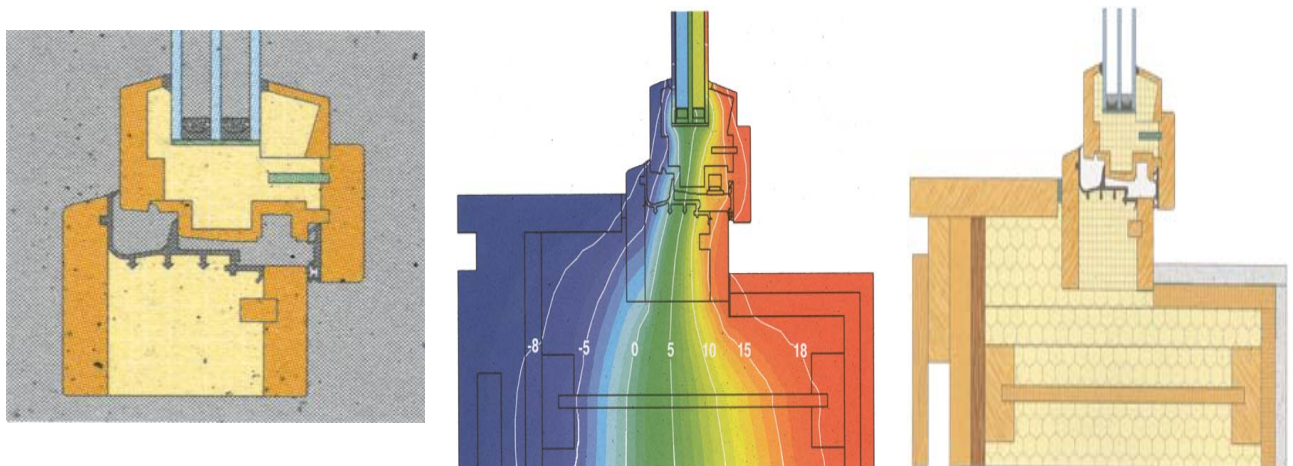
A section view of a Passive House window with the points with the same mean temperature. The correct installation in an insulated wooden wall.
